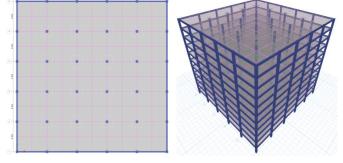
Case 5 LSB-NS a) plan b) 3D view
